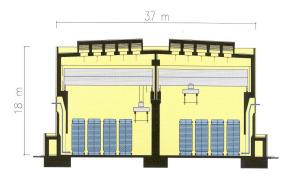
, Cross Section of a Typical Storage Facility for Transport and Storage Cask
